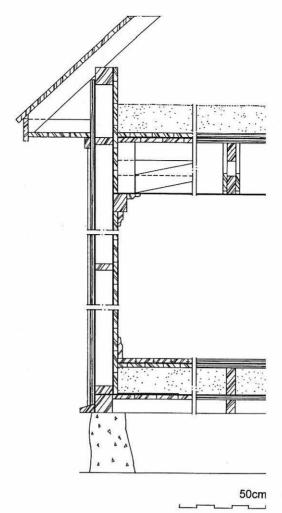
Structure developed by Enso Ltd in 1921. Vertical section 1/20.
